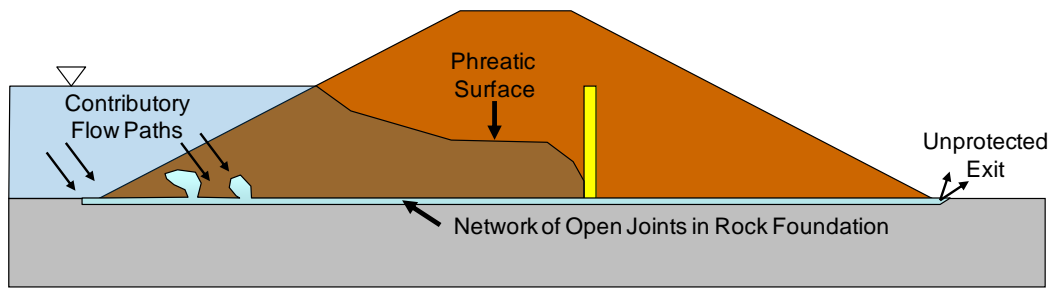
Internal Erosion along the Embankment-Foundation Contact
